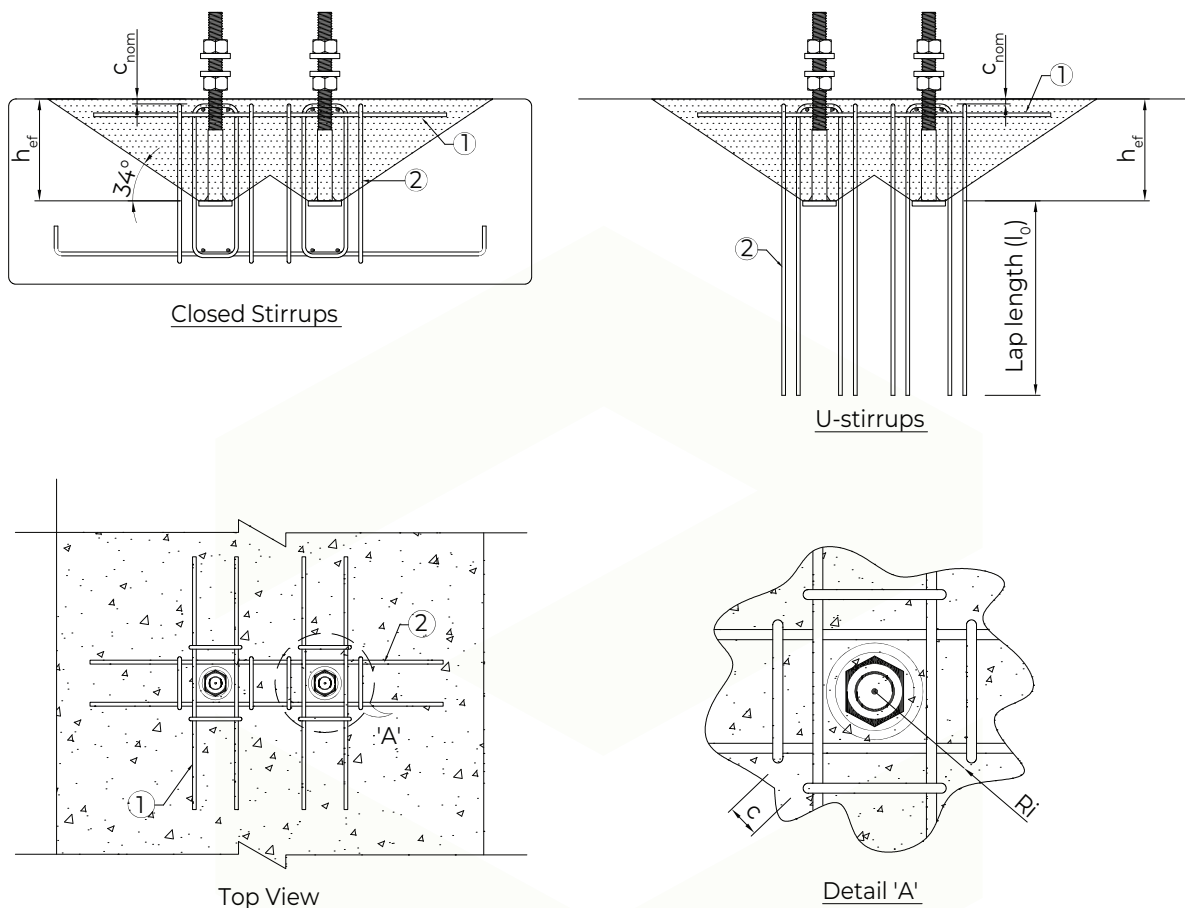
(Concrete Cone Reinforcement for EBB-S)
